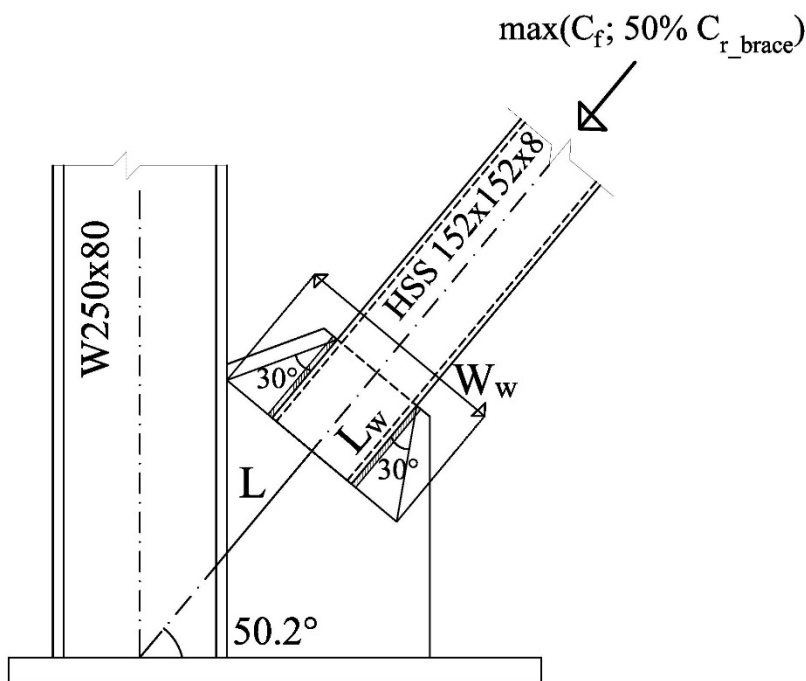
Corner connection detail at ground floor in E-W direction (pre-retrofit connection of 3-storey CBF, Quebec City)
